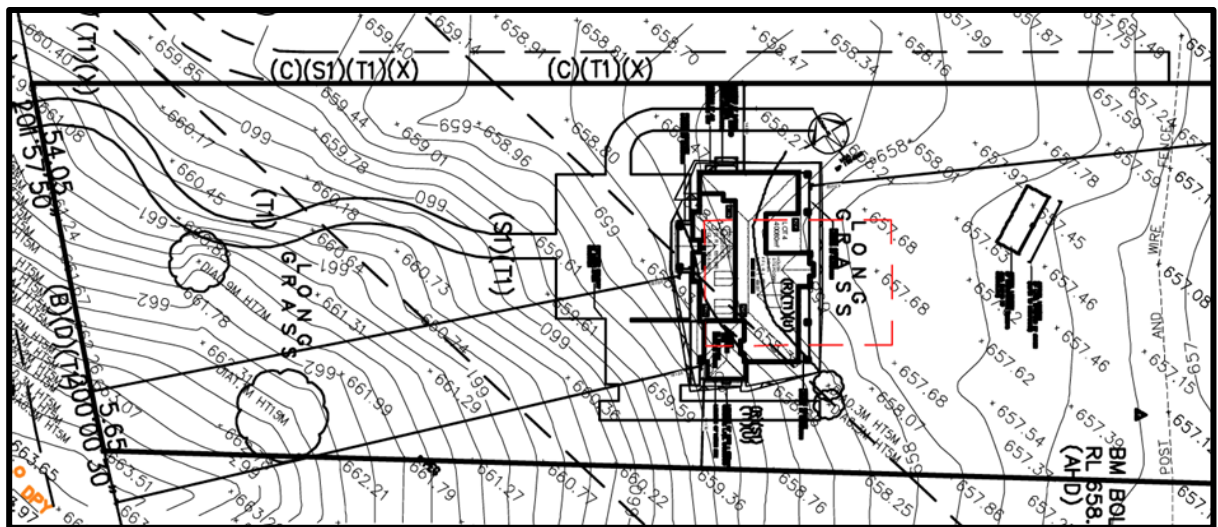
Proposed dwelling (bold black) exceeding the approved building envelope (red).
